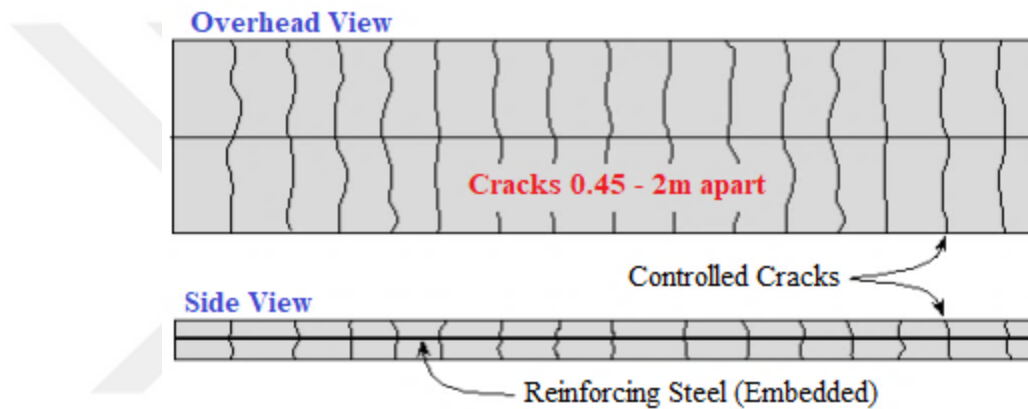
Continuously reinforced concrete pavement (Walubita et al., 2017)
